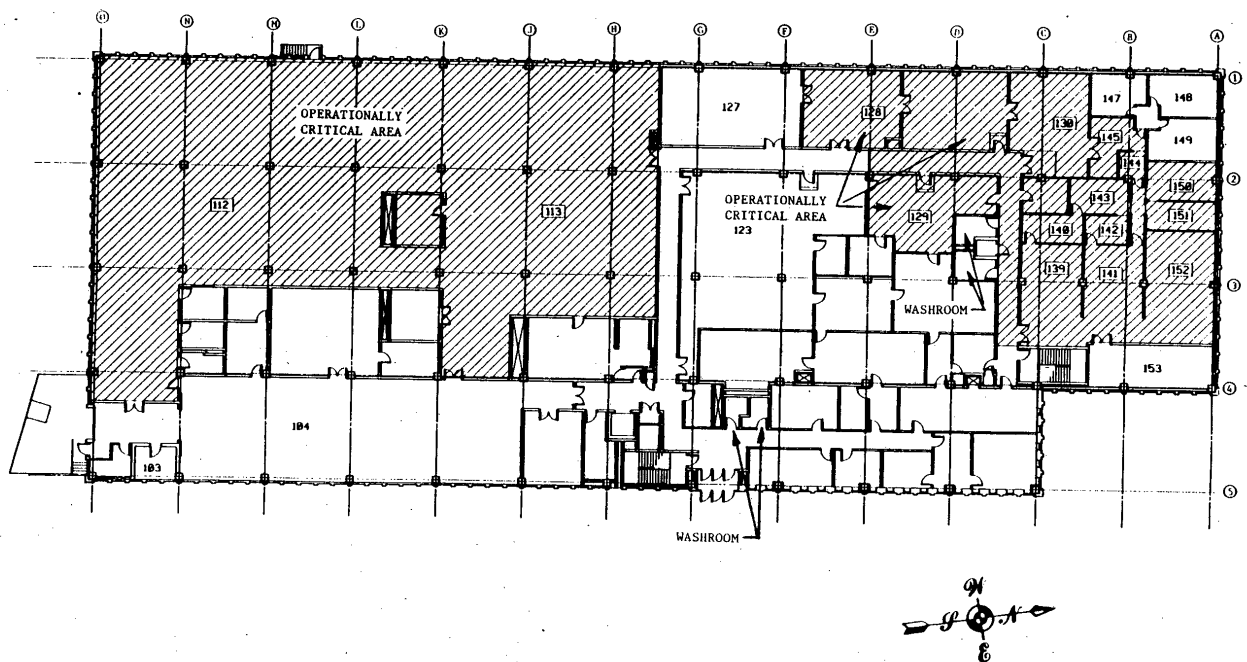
FIRST FLOOR ARCHITECTURAL LAYOUT
